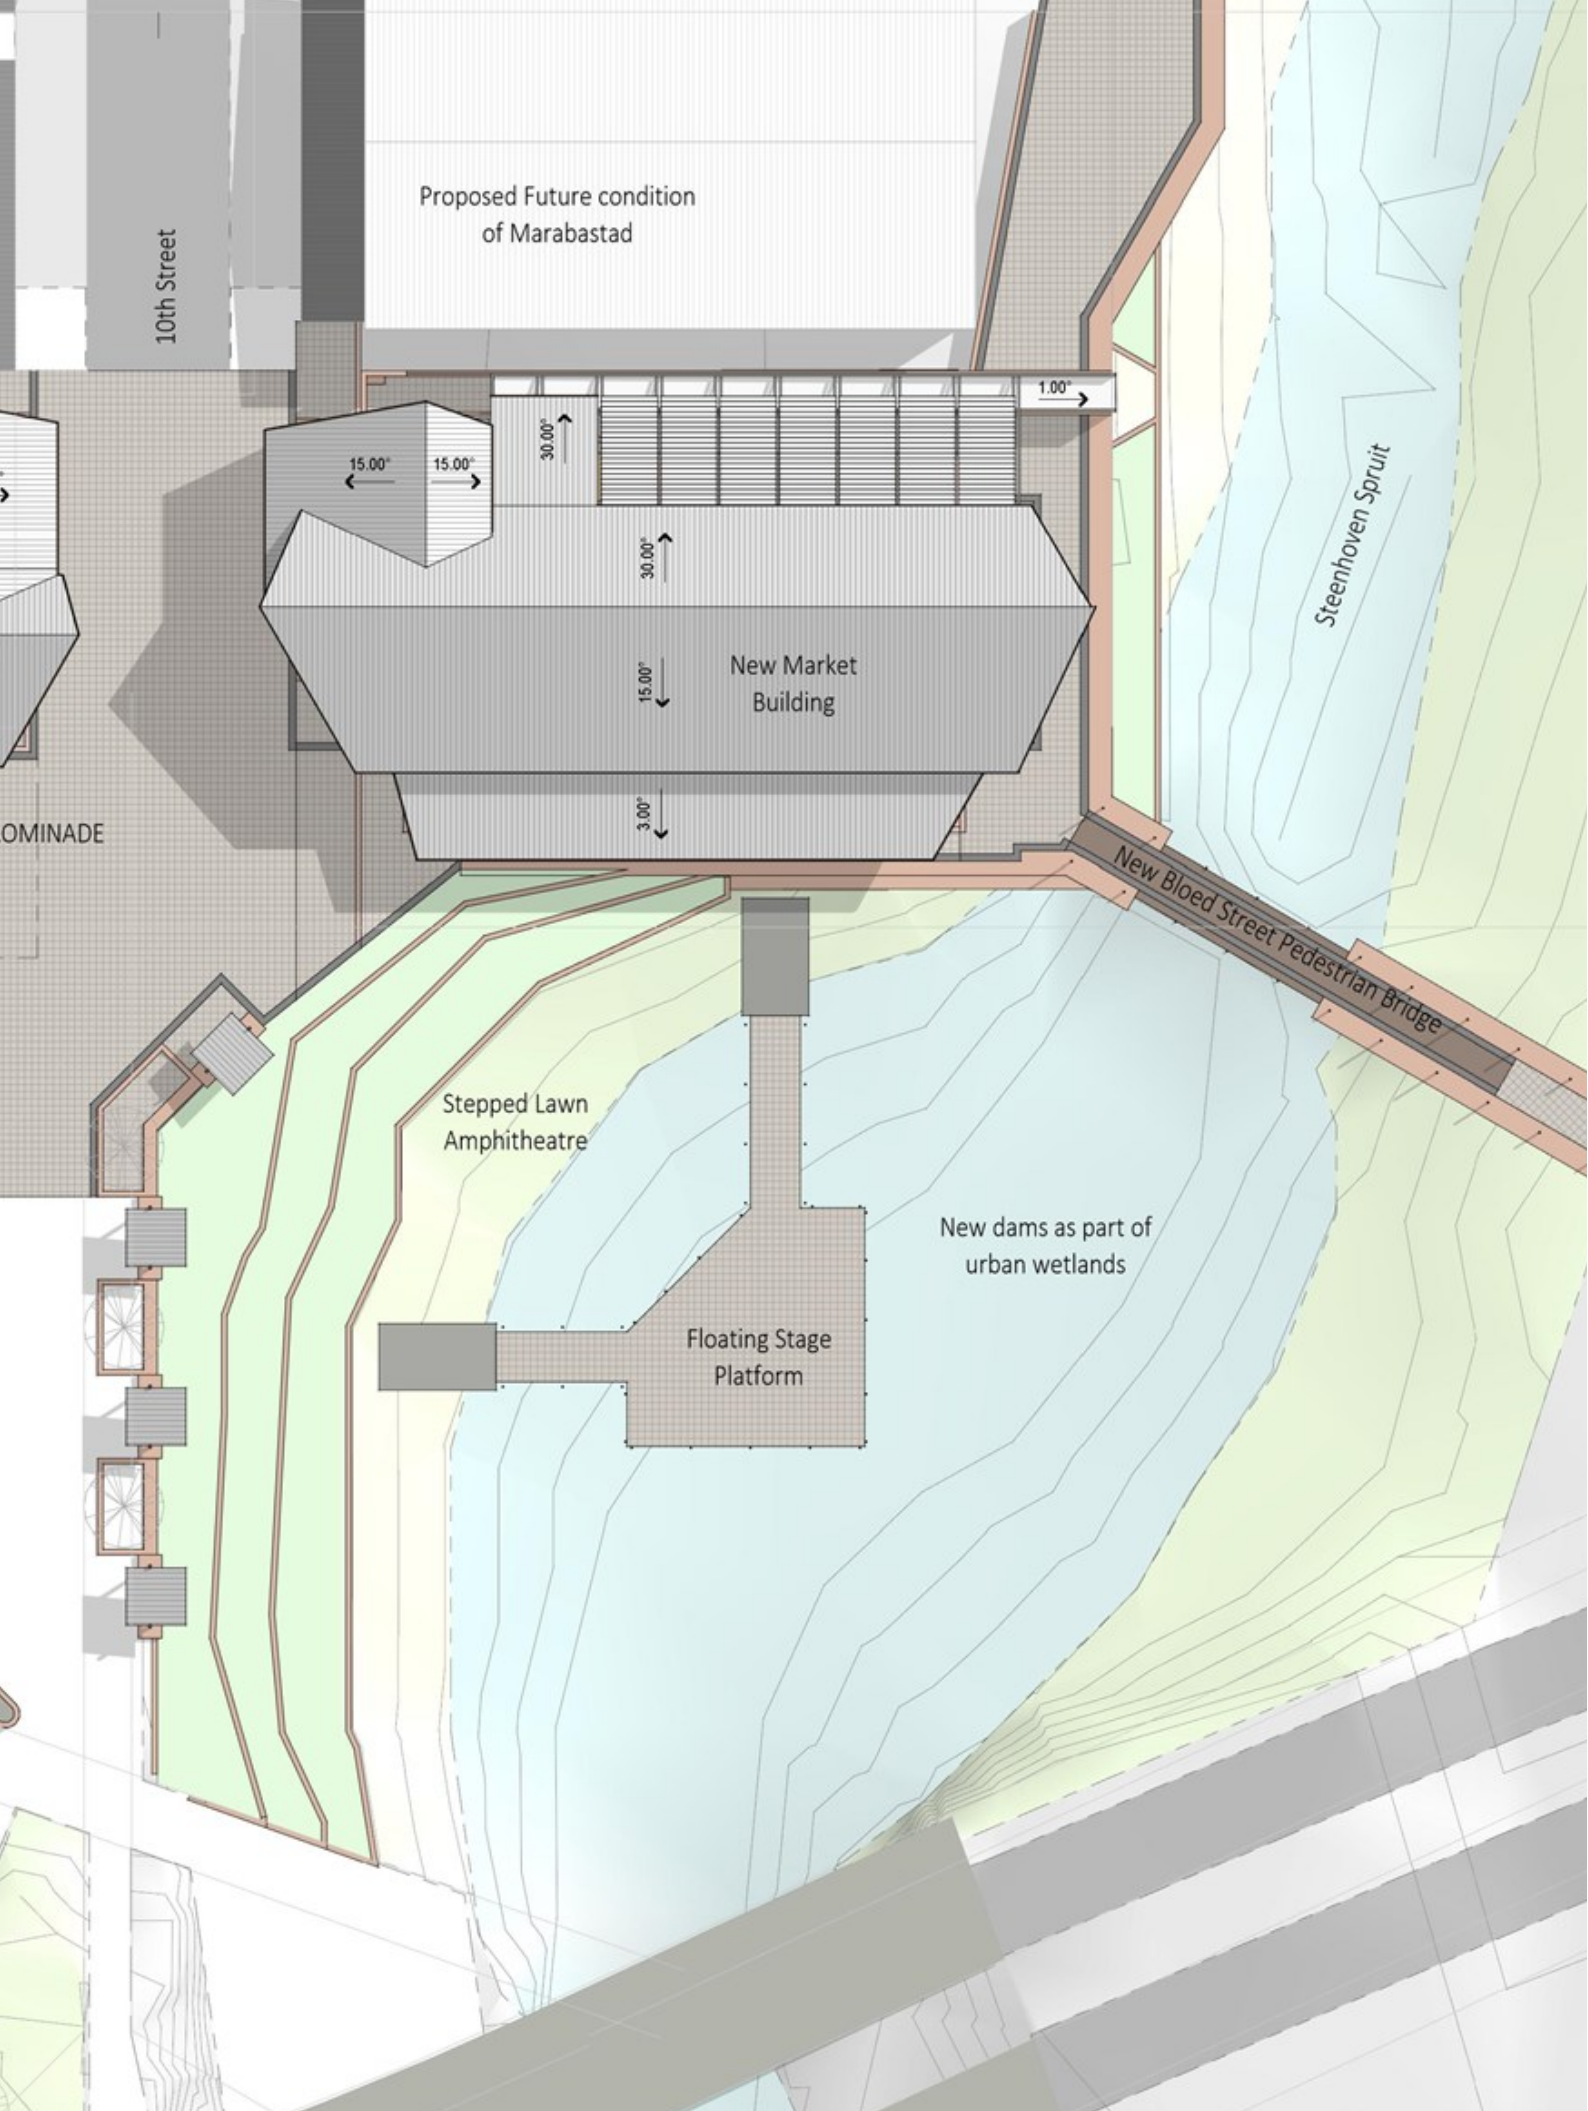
Site/ Roof Plan of Intervention (Author 2020)
